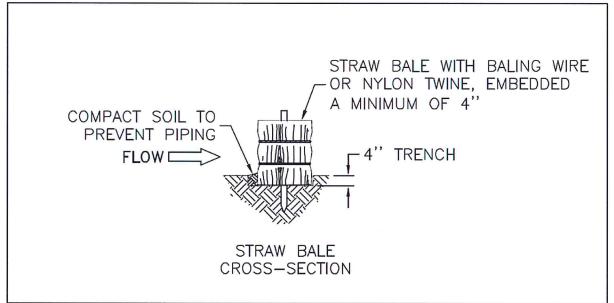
Typical Hay Bale Check Dam (NOTE: Without proper installation, which is rarely done, hay bale check dams always fail.)
